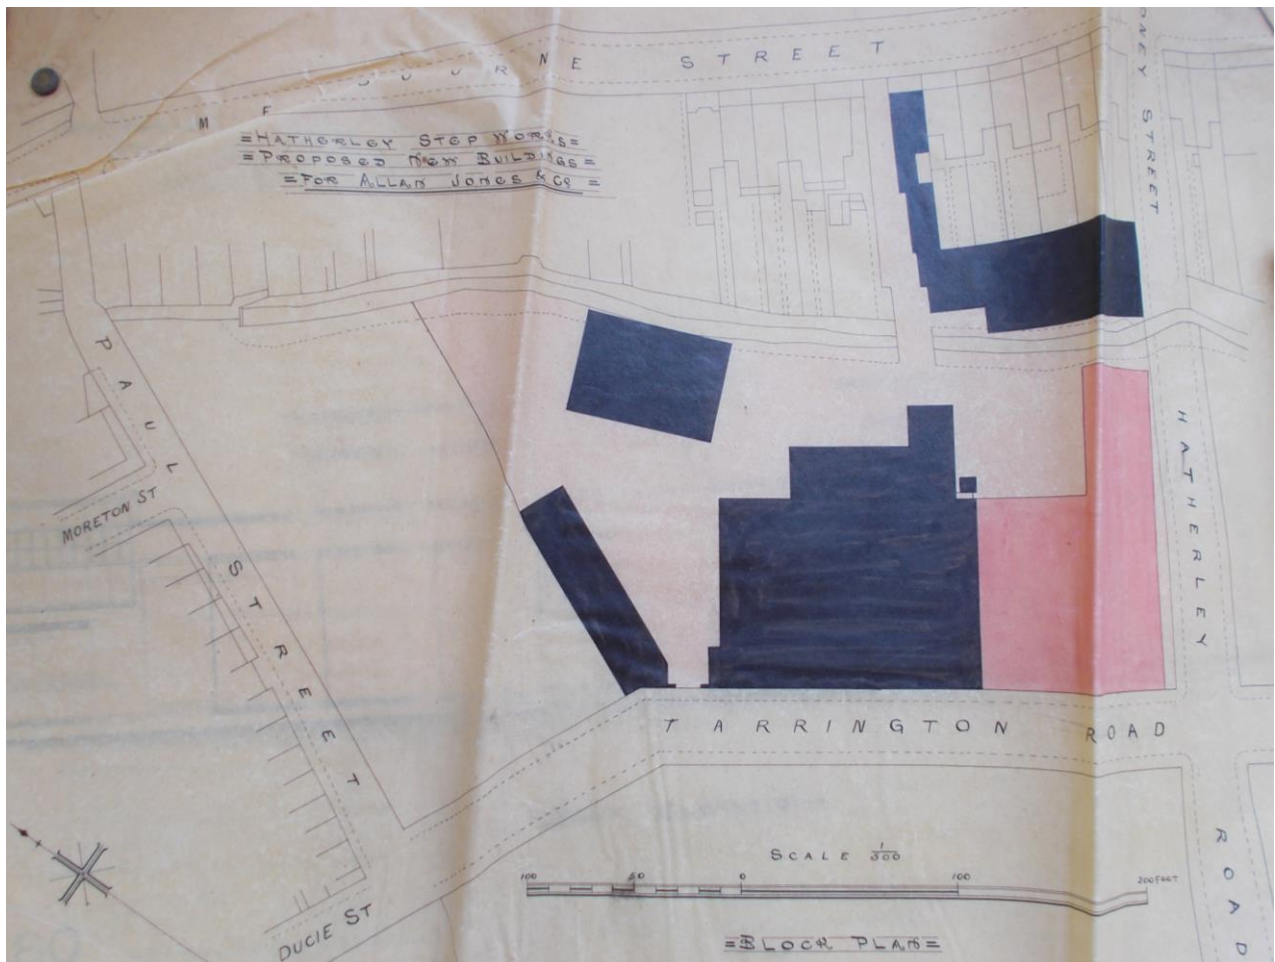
Plans showing proposed layout of Buildings 6 & 7 dated 1897
